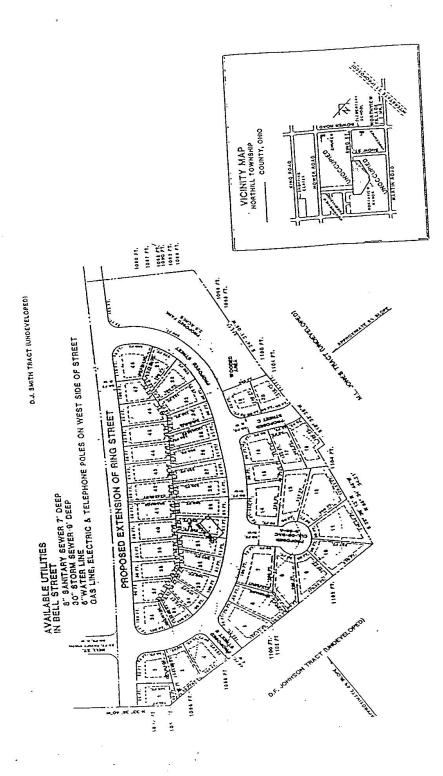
PRELIMINARY SUBDIVISION PLAT
